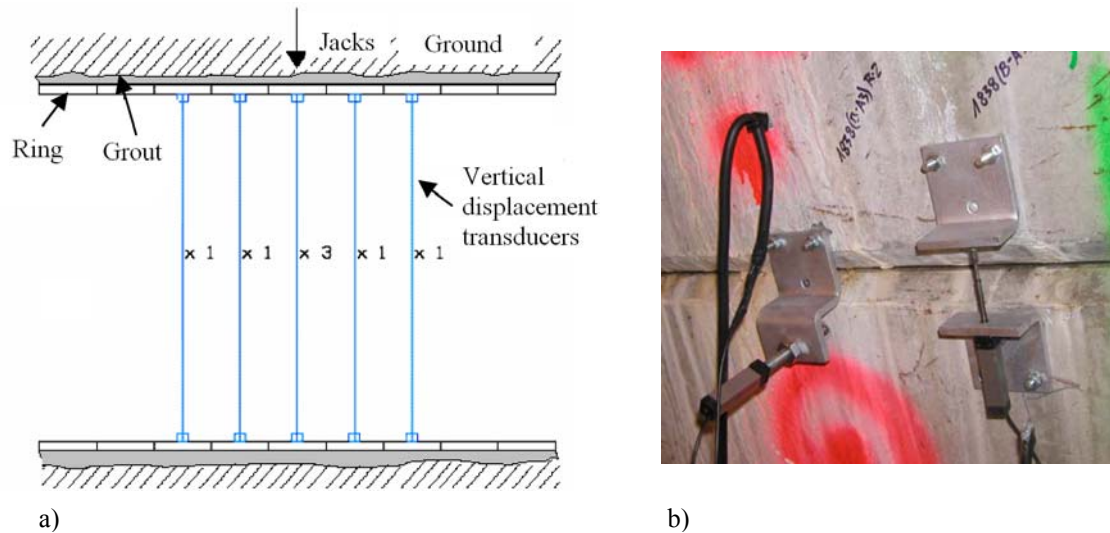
Vertical transducers in the tunnel cross section (a) and 2D transducers in joints (b).
